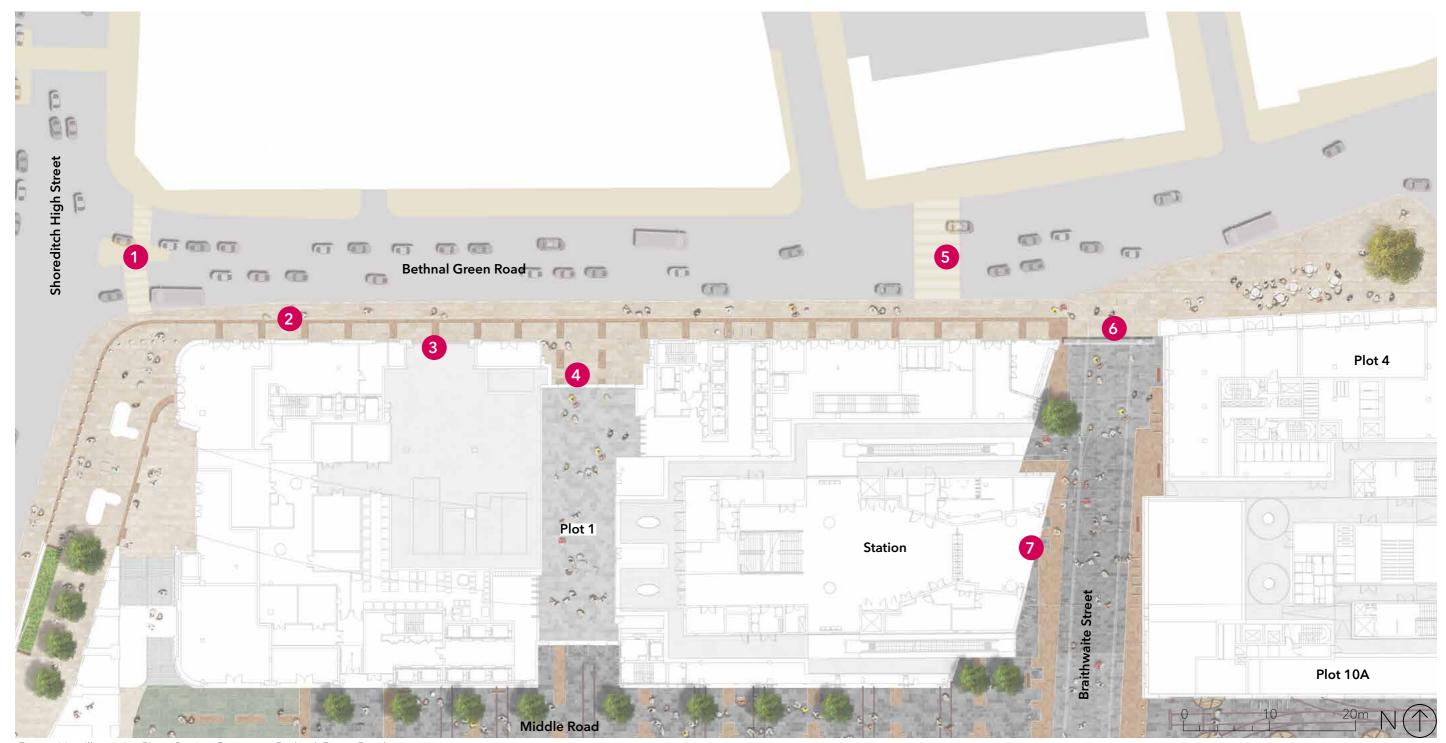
Illustrative Plan - Station Gateway + Bethnal Green Road
